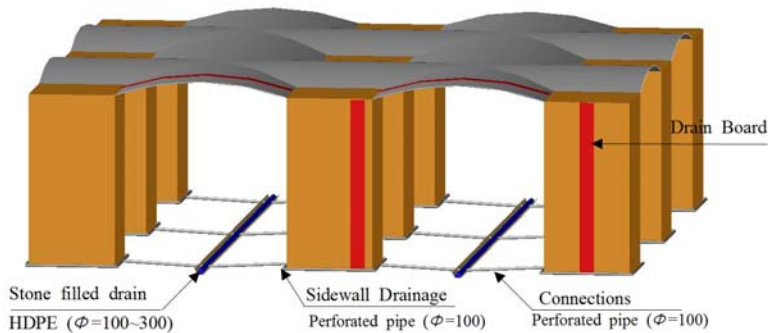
Schematics of drainage system on room-and-pillar underground structure
